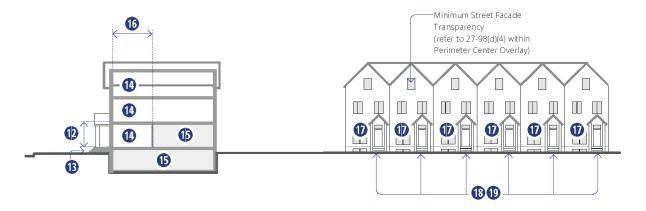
Townhouse Building: Floor-to-Floor Height & Use Requirements
